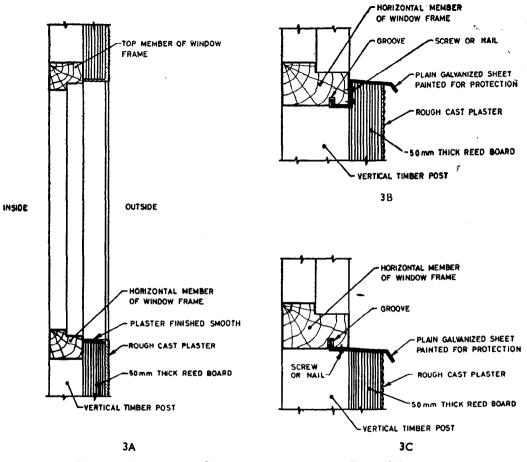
DETAILS OF CONSTRUCTION FOR THE REED WALLING
